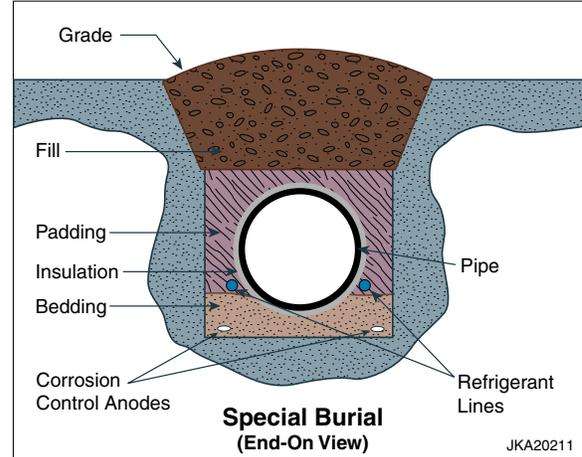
Typical Pipeline Details for Special Burial (Source: TAPS Owners 2001a, Figure 4.2-3)
